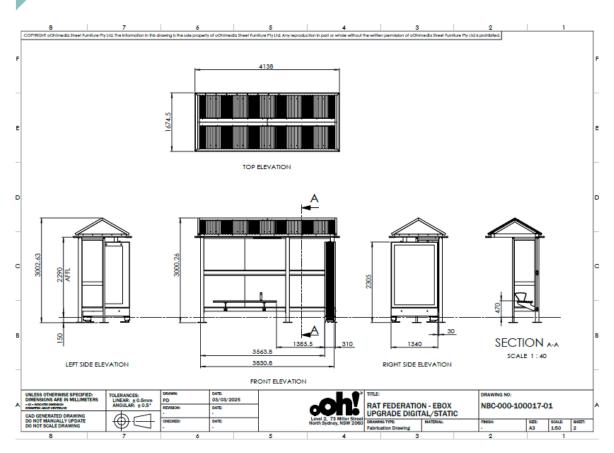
Proposed Digital/Static Signage Elevation – Rationalised Federation
